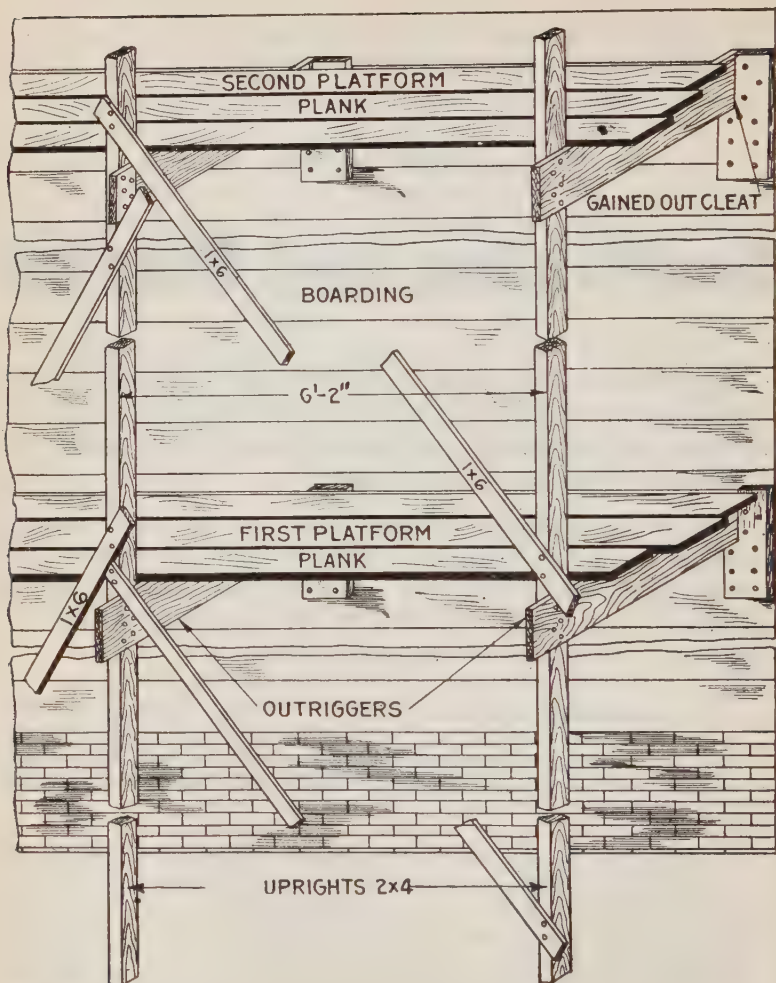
,076.—Simple scaffold built on side of wooden buildings and consisting of uprights, outriggers, cleats, and planks or scaffold boards, forming the platforms.
